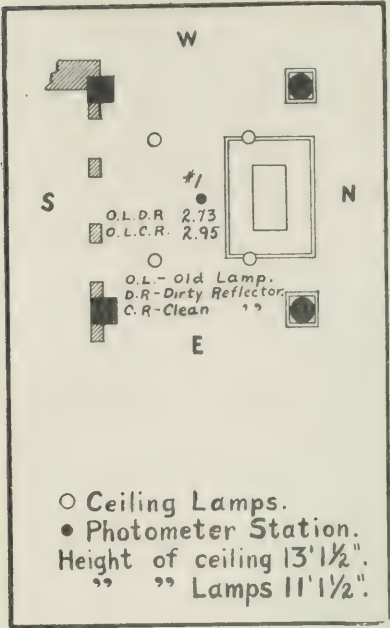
Section plan of fourth floor, (toy department), showing location of furniture, pillars, lighting units, test stations and illumination data.
